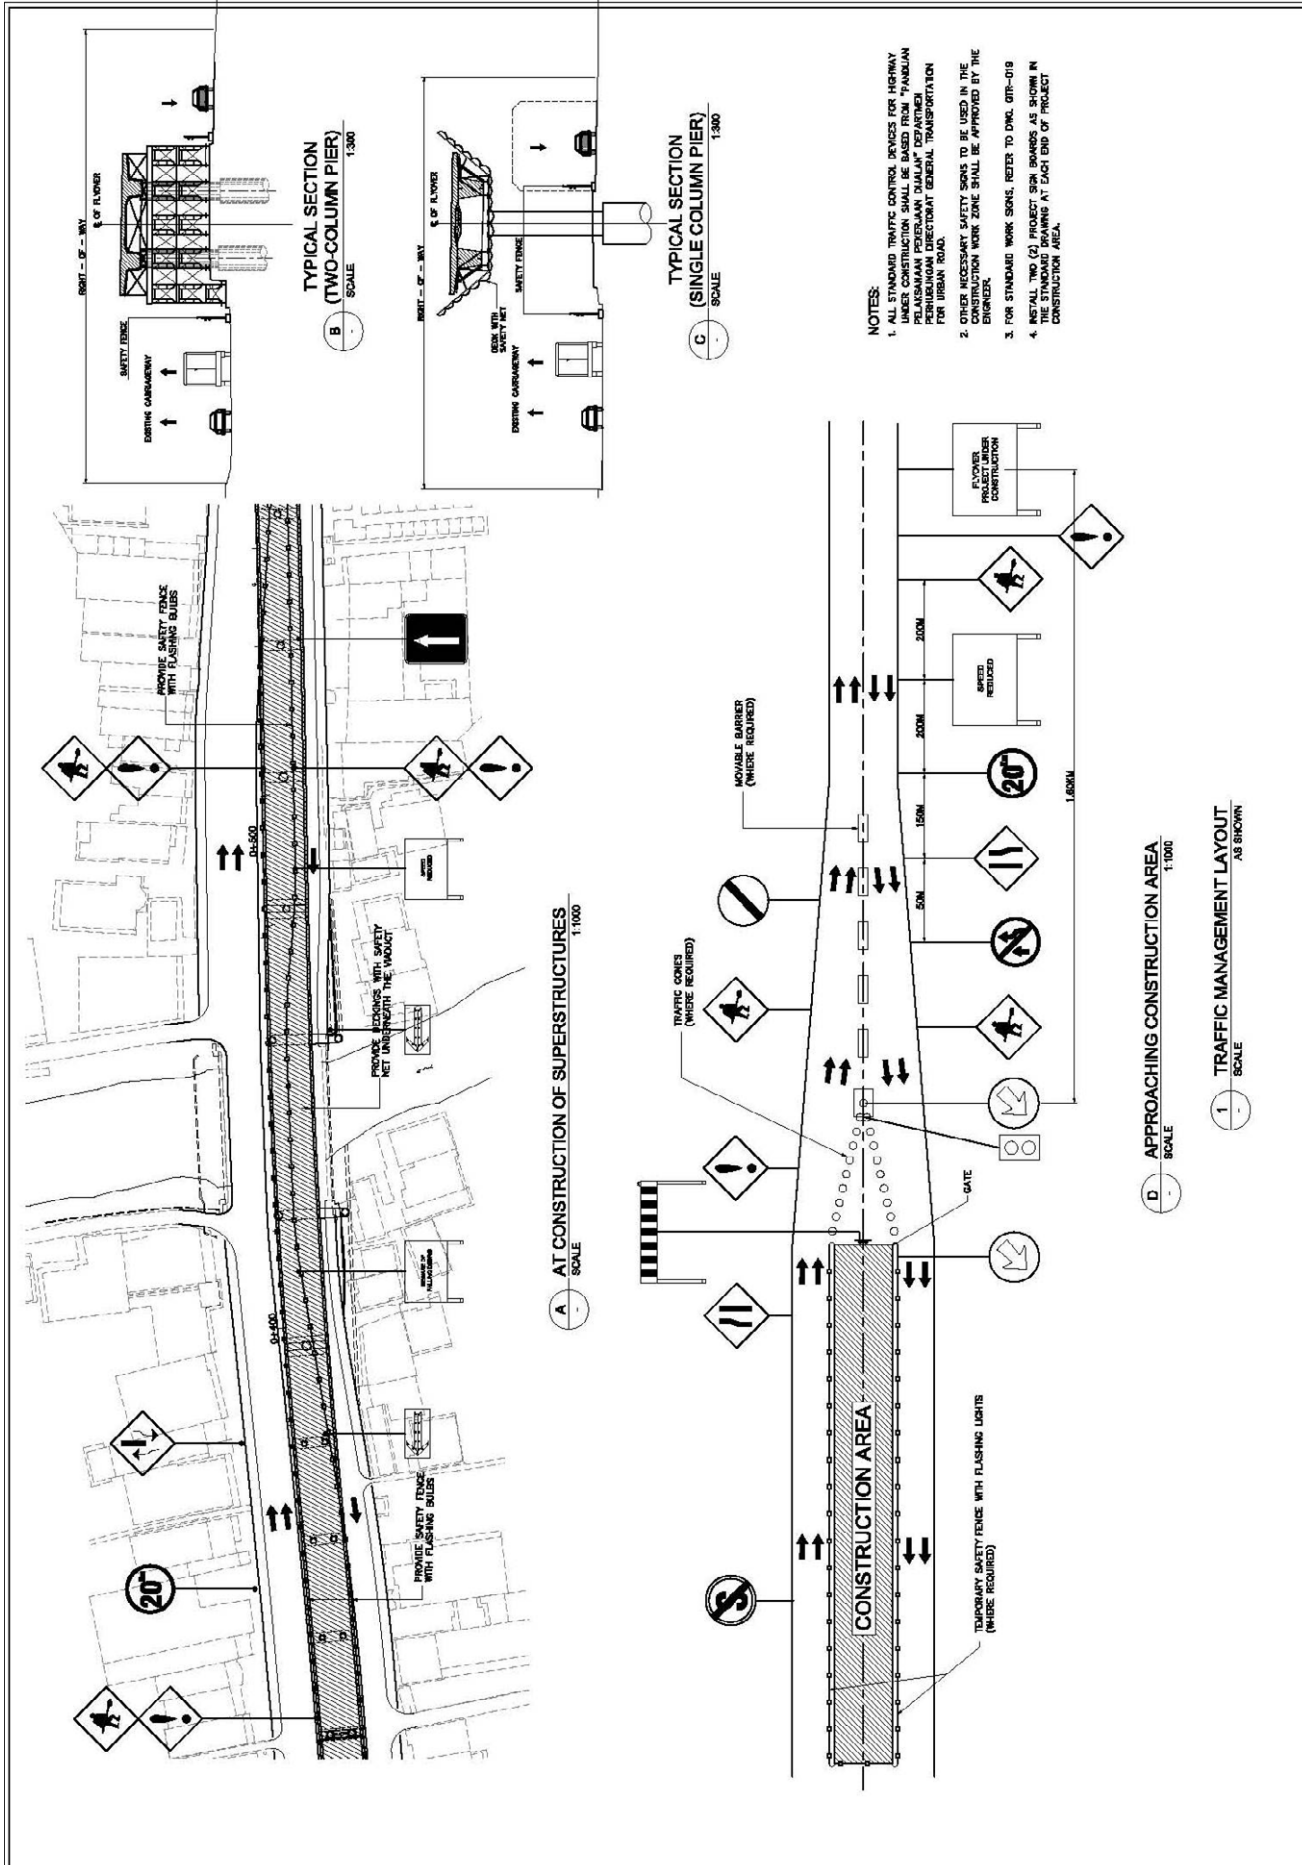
INSTALLATION OF GIRDER AND TRAFFIC FLOW (GEBANG FLYOVER)
